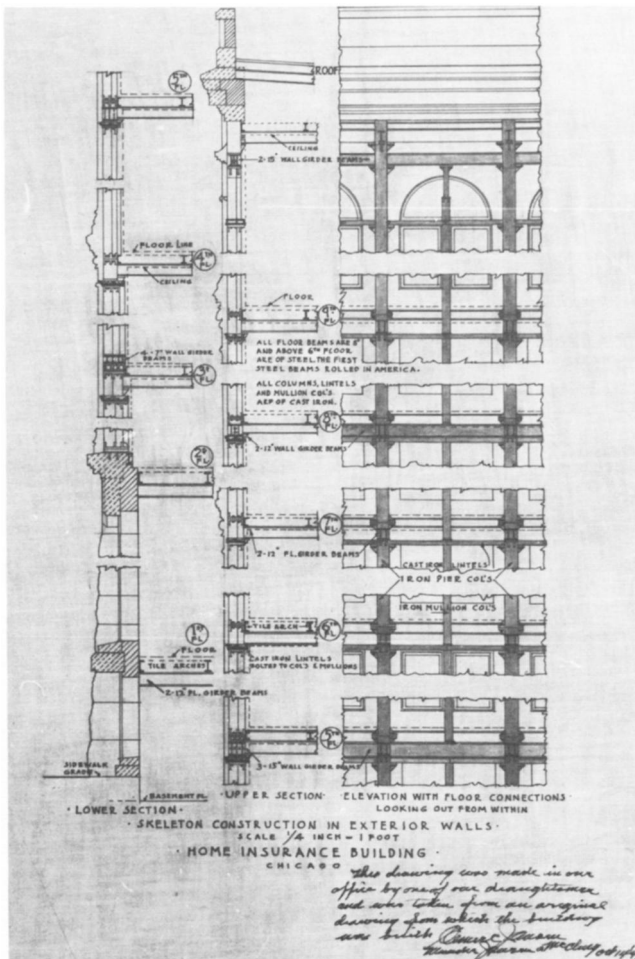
Jenney, Home Insurance Building. Elevation of structural iron members in the exterior, showing the location of the transfer beams at Floors 4, 6, 9, and roof (Jensen & Halstead, Ltd., Chicago).
